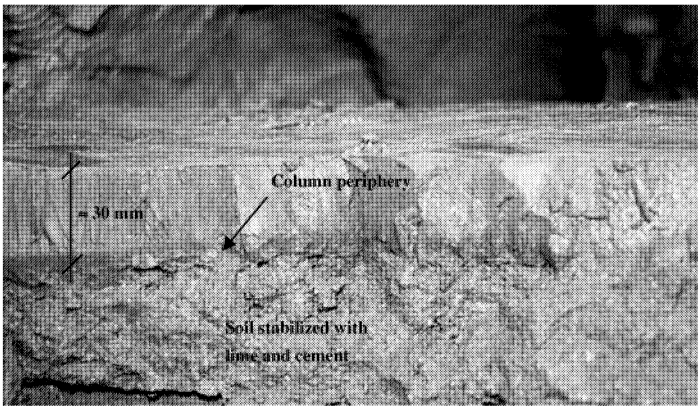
Boundary zone between column and surrounding soil (author's work, 1998).
